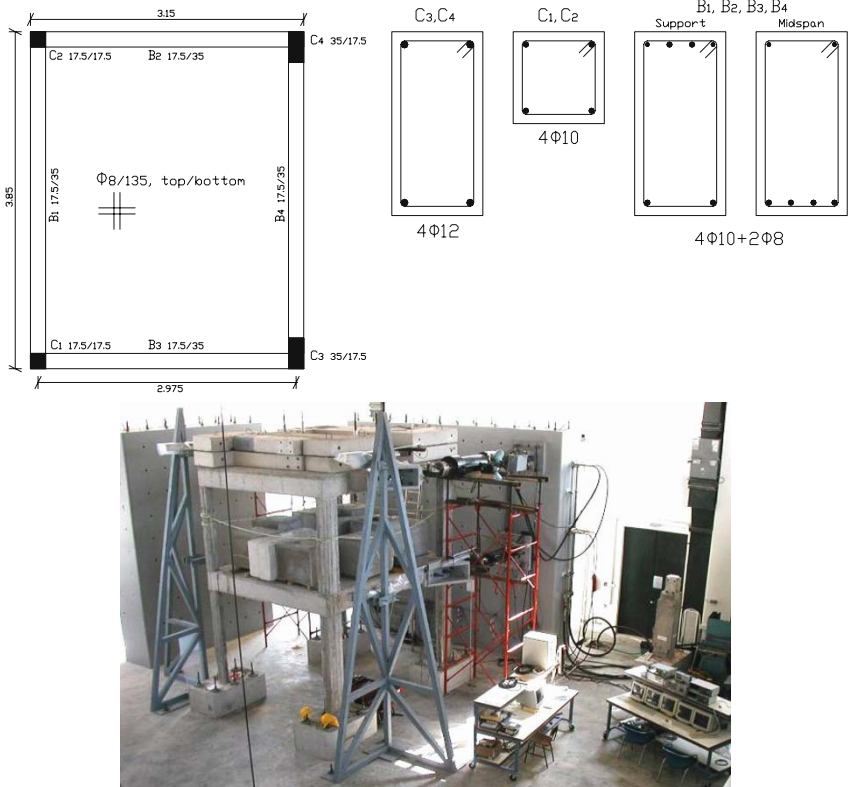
0.7:1 scale test structure: framing plan, member reinforcement and general view
